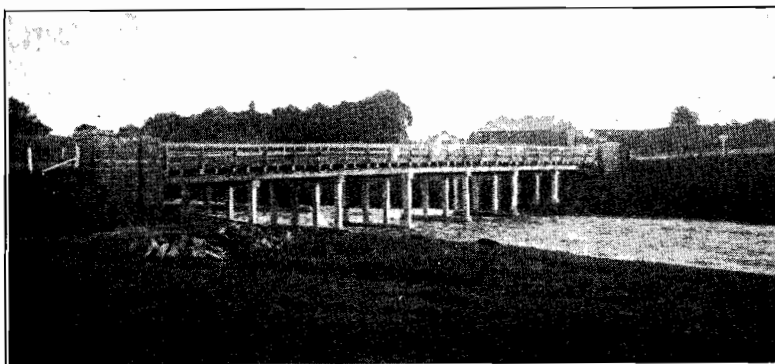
Showing new bridge erected over the Mt. Emu Creek at Panmure on the Prince's Highway.
